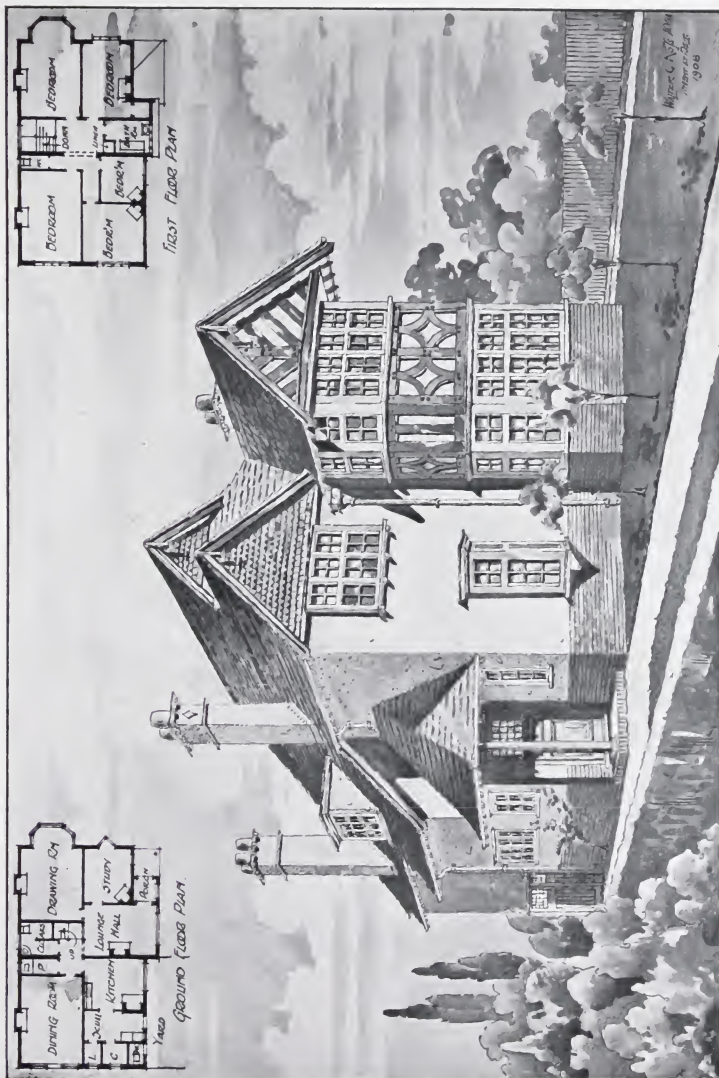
HOUSE AT WESTCLIFF-ON-SEA.
